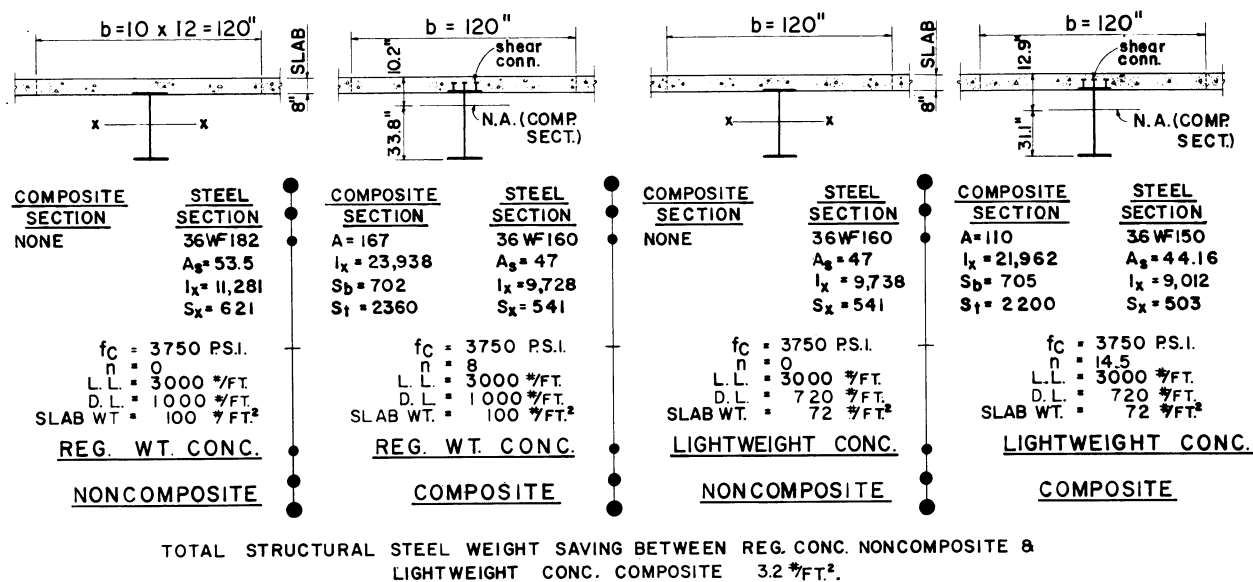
Framing study for composite design. Cobo Hall exhibit floor—Hall C.
